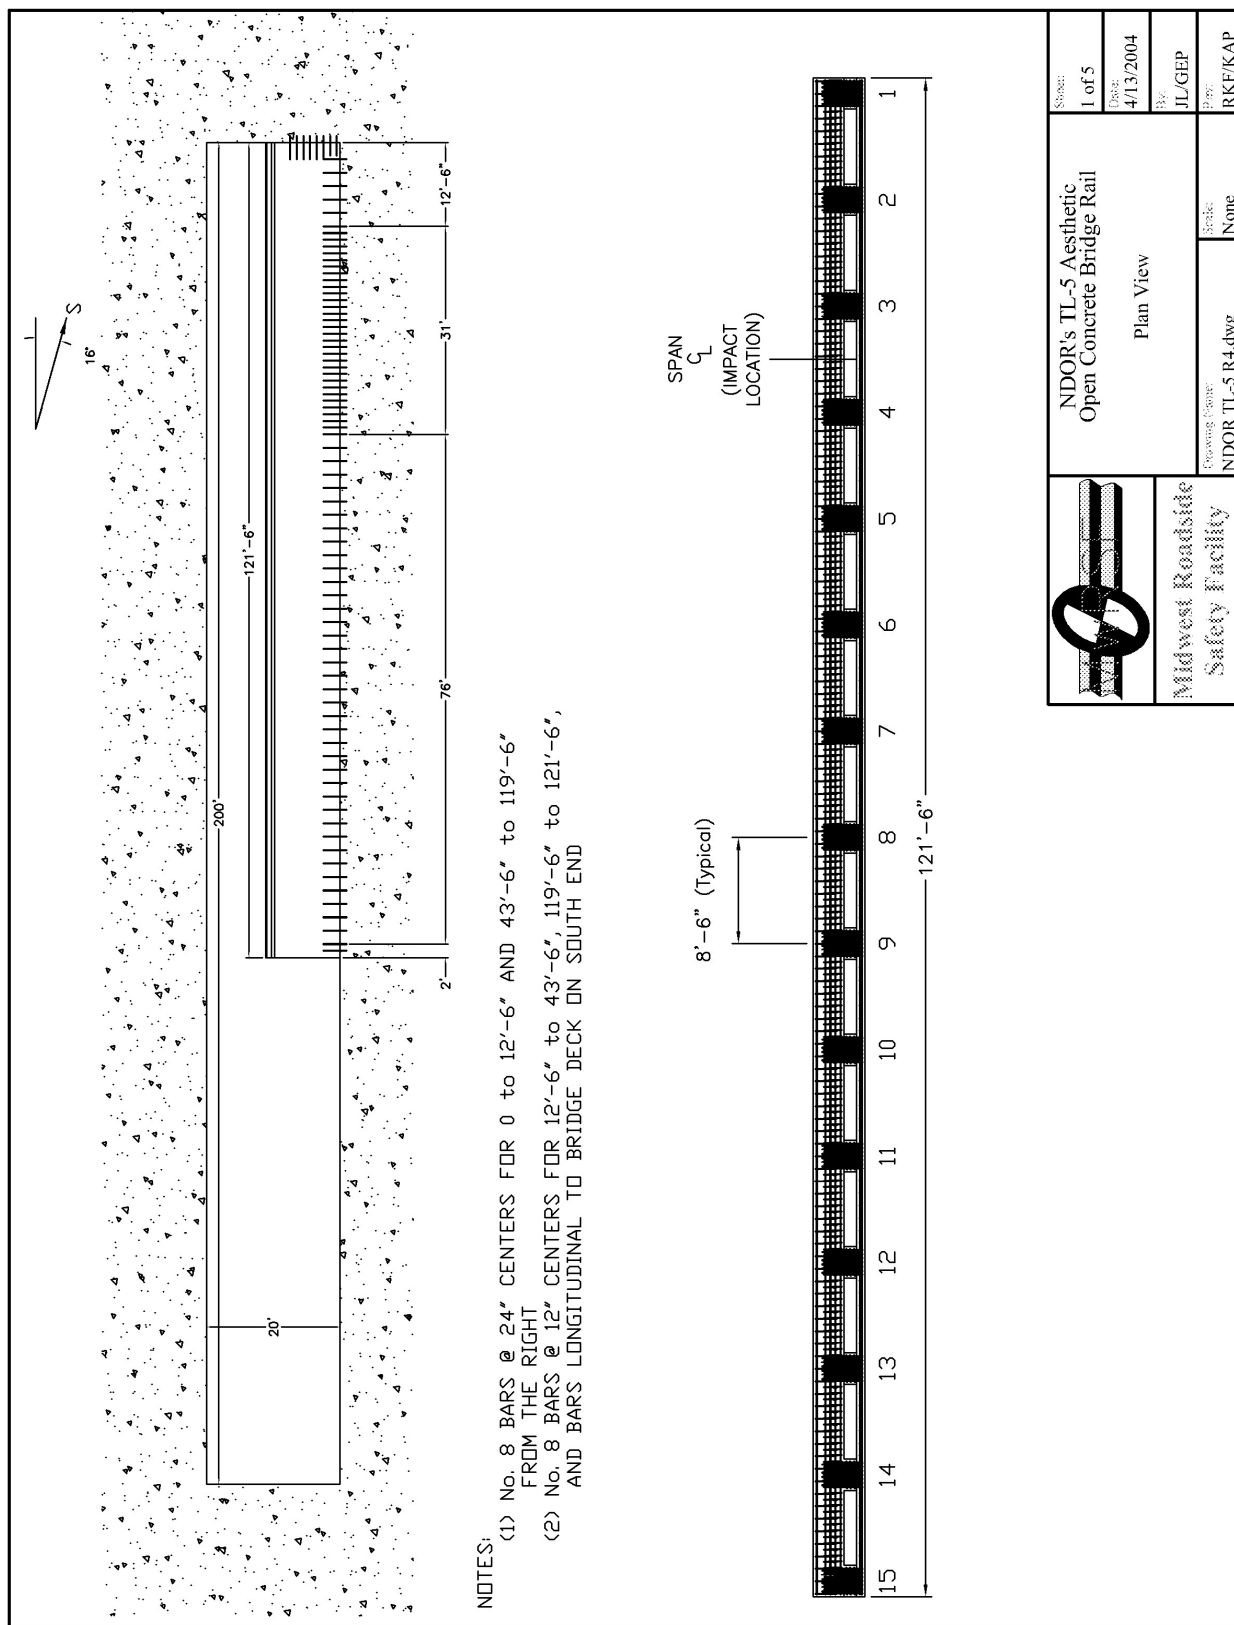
Layout for NDOR's TL-5 Aesthetic Open Concrete Bridge Rail (English)
